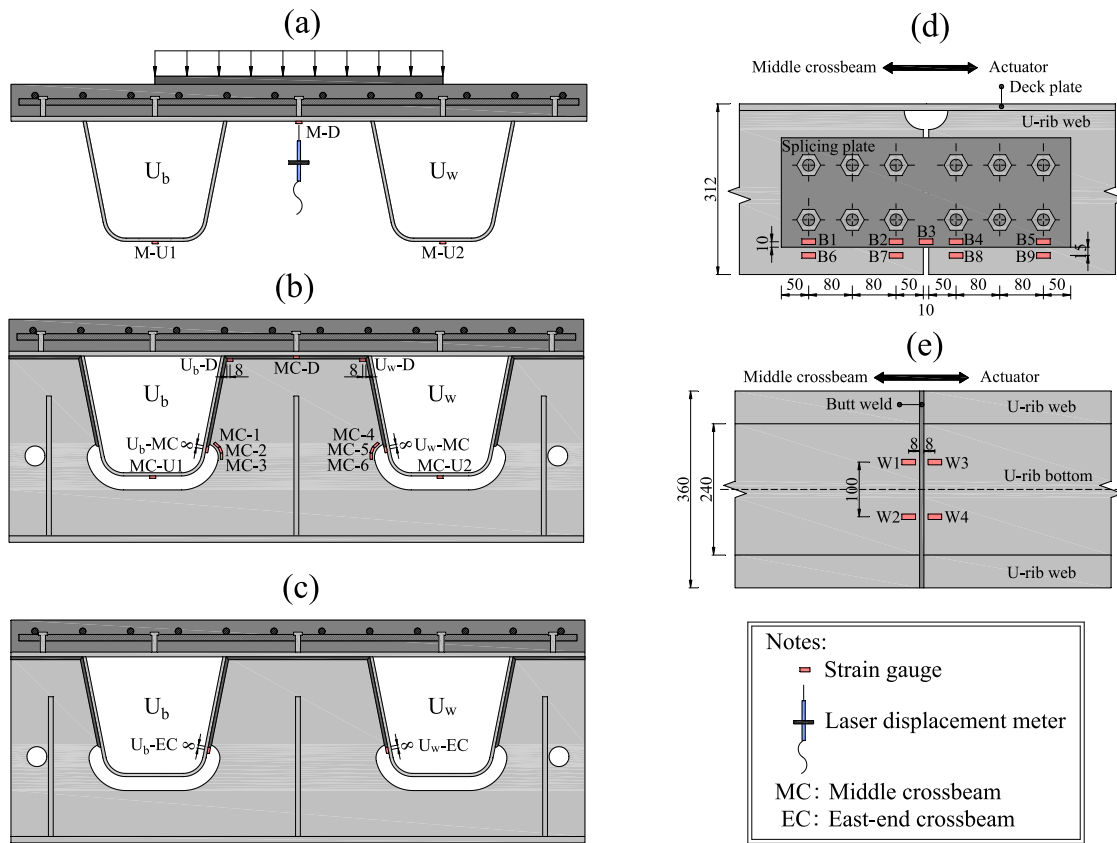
Instrumentation of specimen (unit: mm): (a) mid-span section of loading span; (b) section at the middle cross beam (MC); (c) section at the east-end cross beam (EC); (d) U-rib bolted joint; (e) U-rib butt-welded joint.
